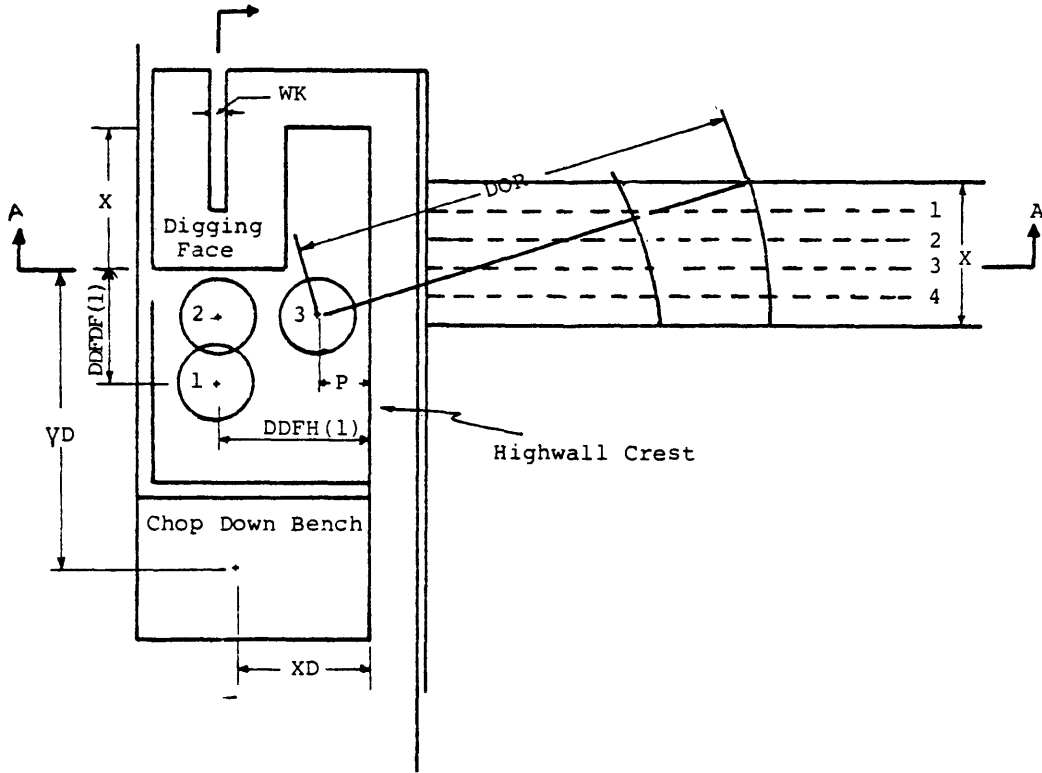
Model Variables Illustrated in Plan and Cross Section.
